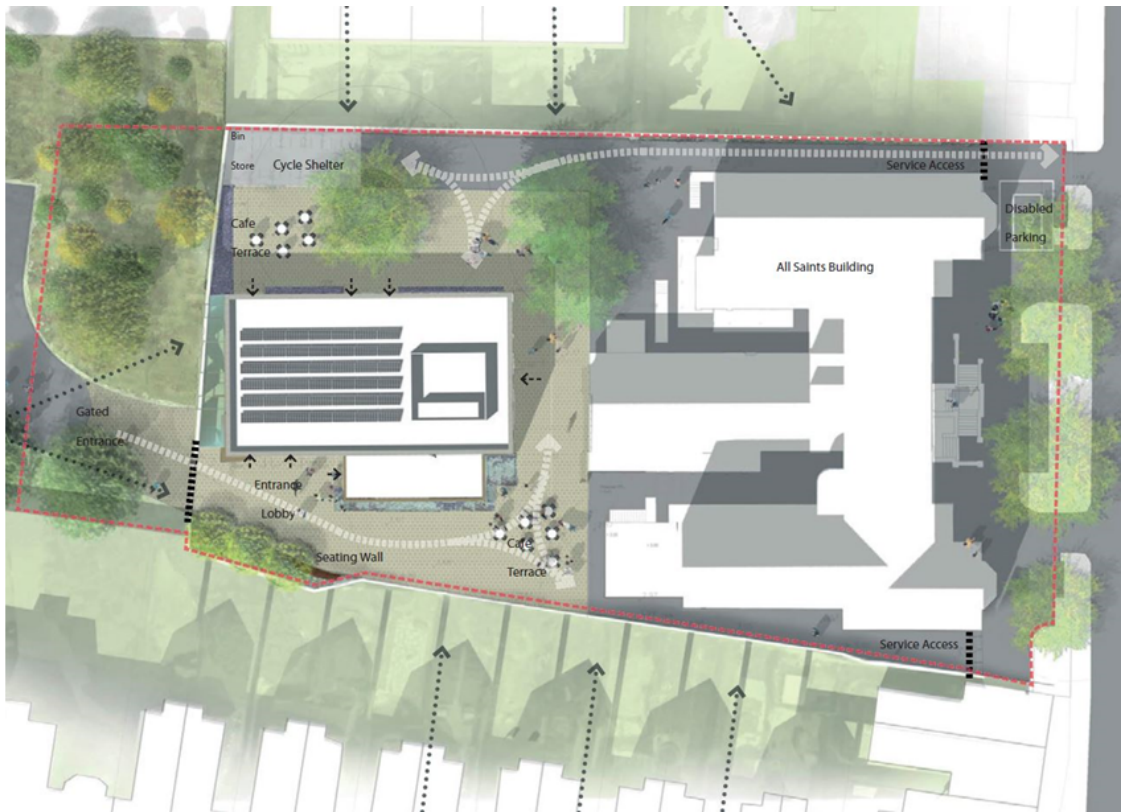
The proposed site plan, showing how the new building would be positioned on the rear yard.
